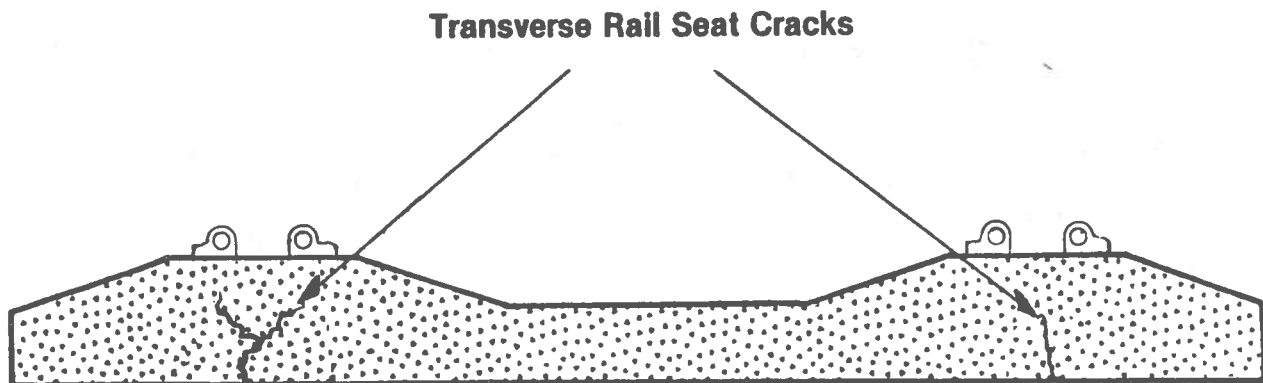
CONCRETE TIE TRANSVERSE RAIL SEAT CRACKS
